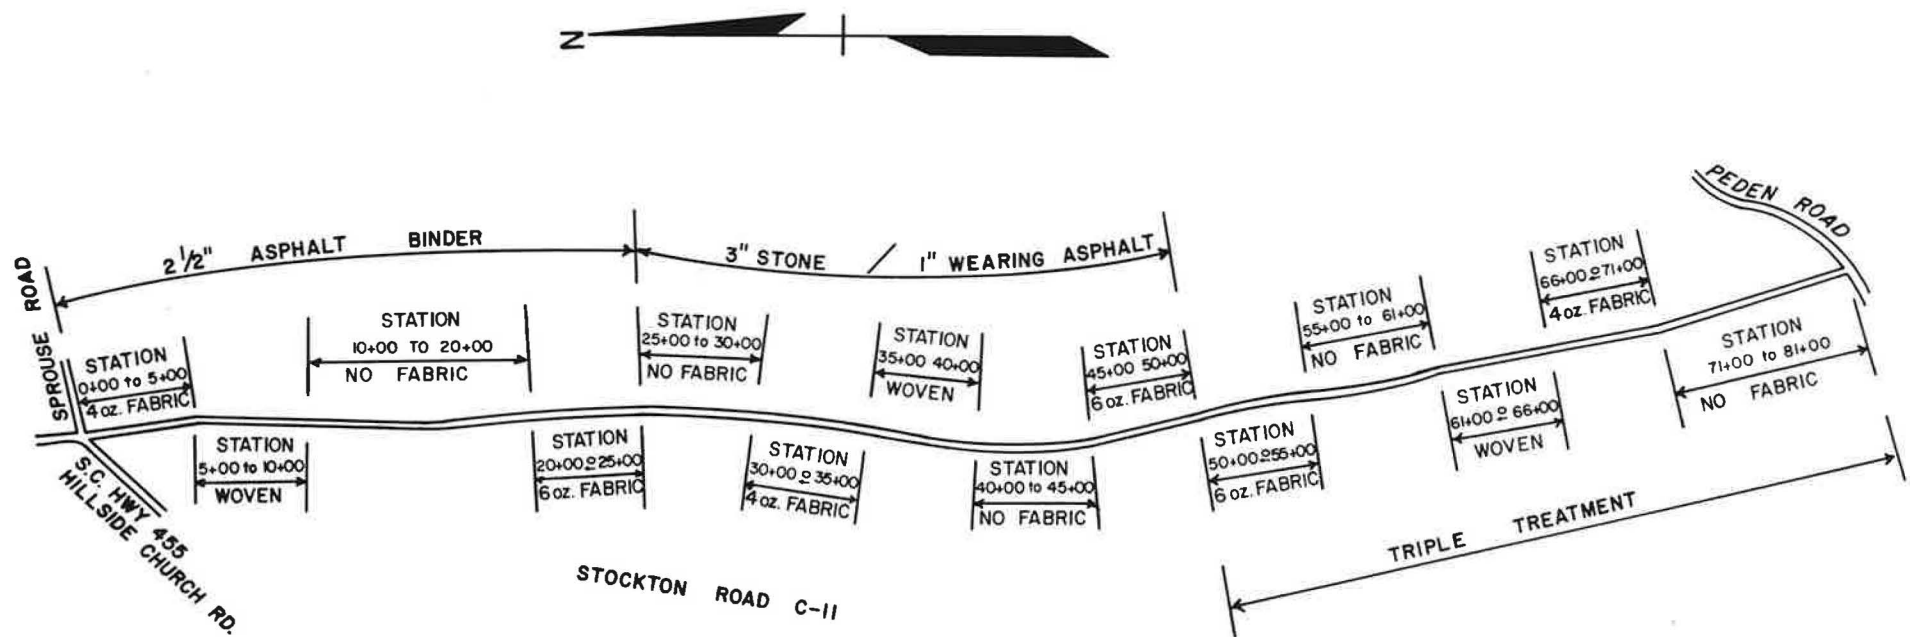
Stockton Road experimental paving plan of May 11, 1987.
